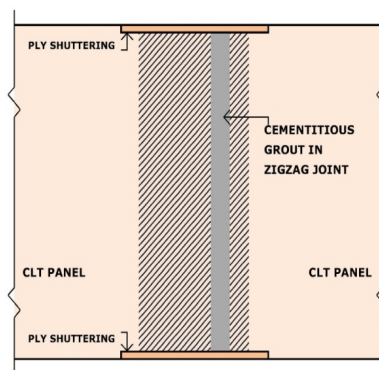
Section (X-X) of zigzag joint for external walls of the central core
